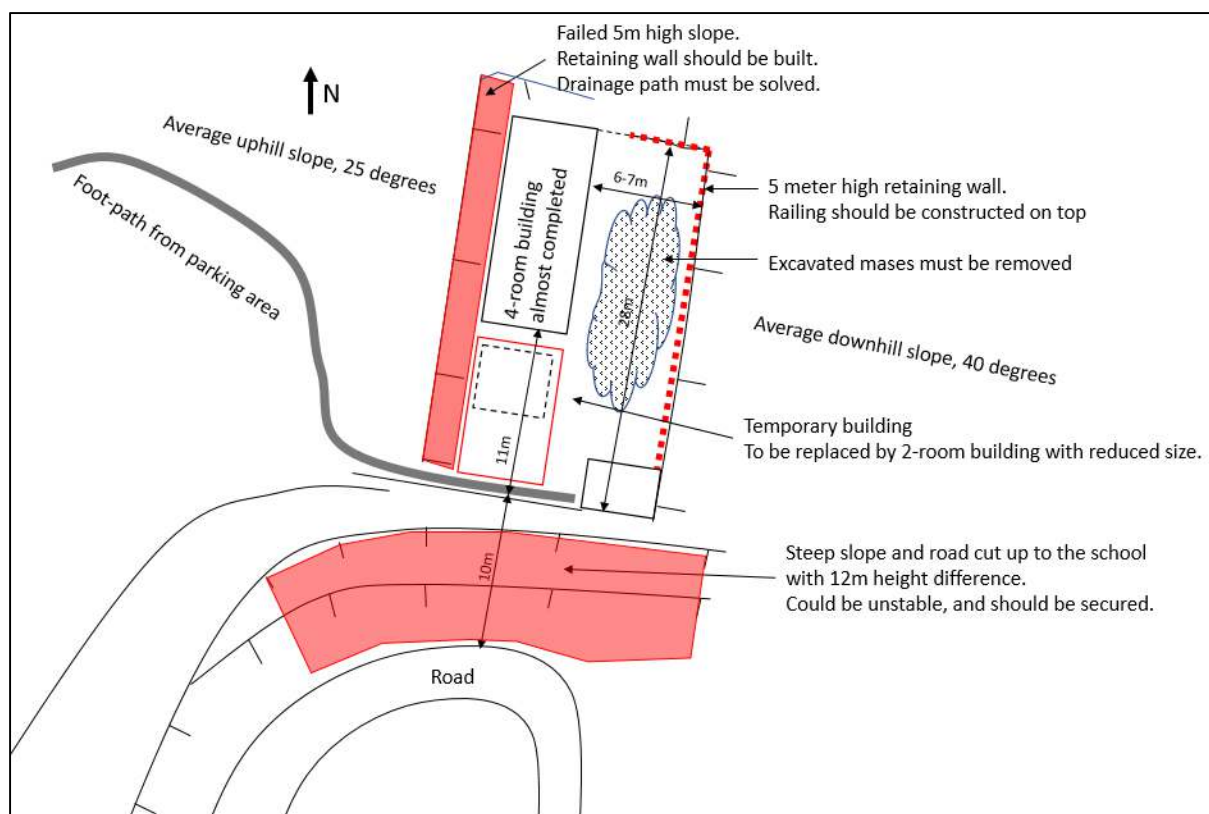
Plan view – Jana school. A gabion wall should be constructed, both at the backslope failure already has occurred (west) and at the slope towards the road (south) where the height difference is 14m. Water from the terraces should not be permitted to flow down the backslope. For safety, we recommend to railings in front of the school where the wall height is about 5m and the slope continues steep downwards.
